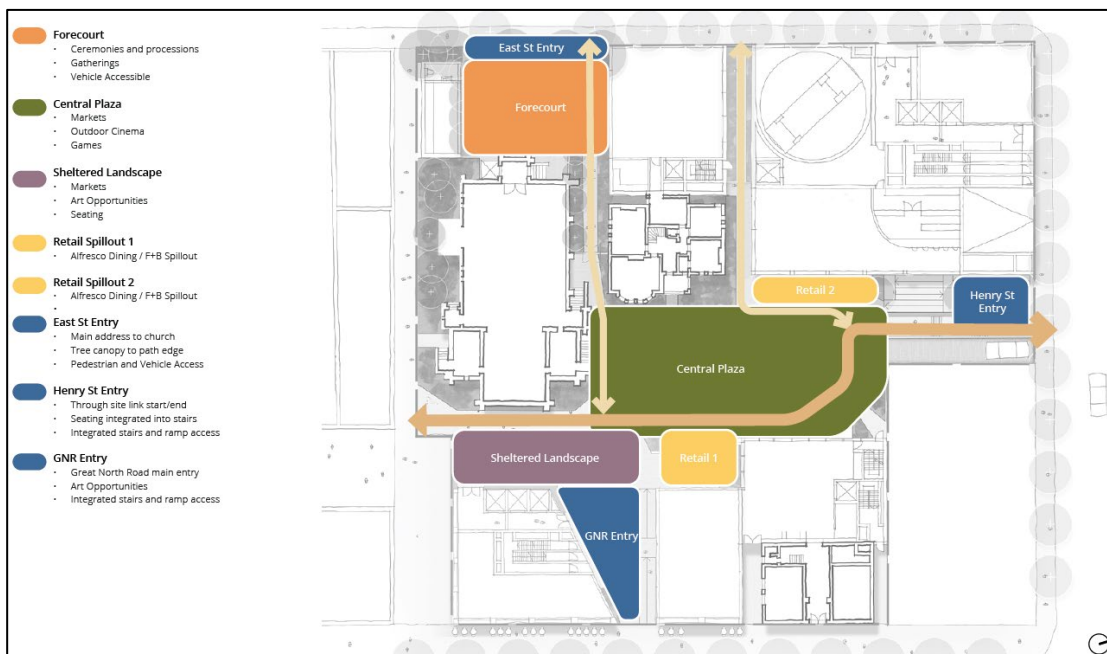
OPEN SPACE AND ACTIVATION STRATEGY
